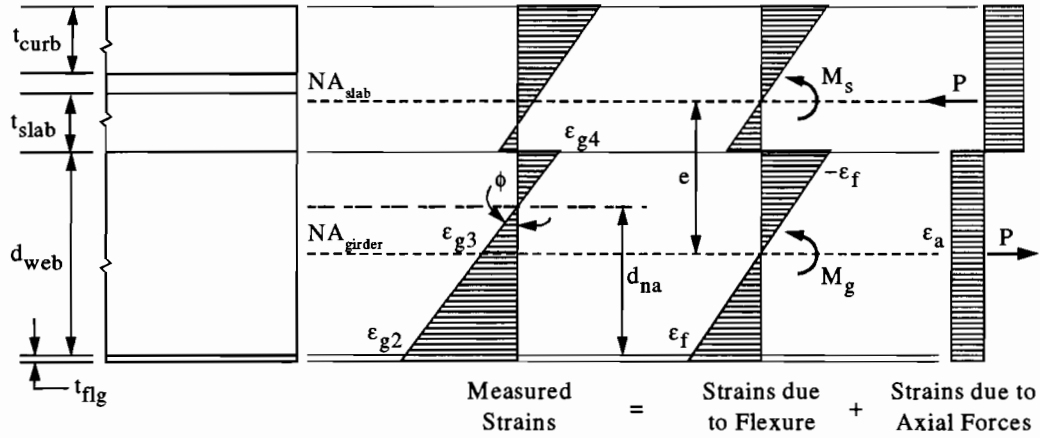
Assumed Strain Distribution for a Typical Exterior Girder Section.
